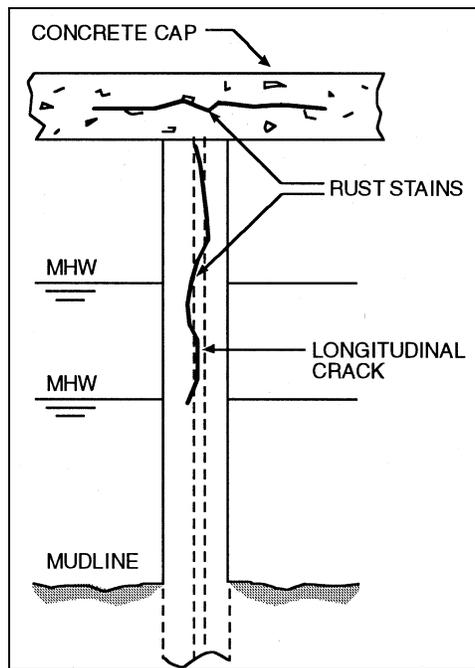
Longitudinal Cracks in Precast Concrete Pile from Freezing of Cast-in-Place Jet Pipe.
